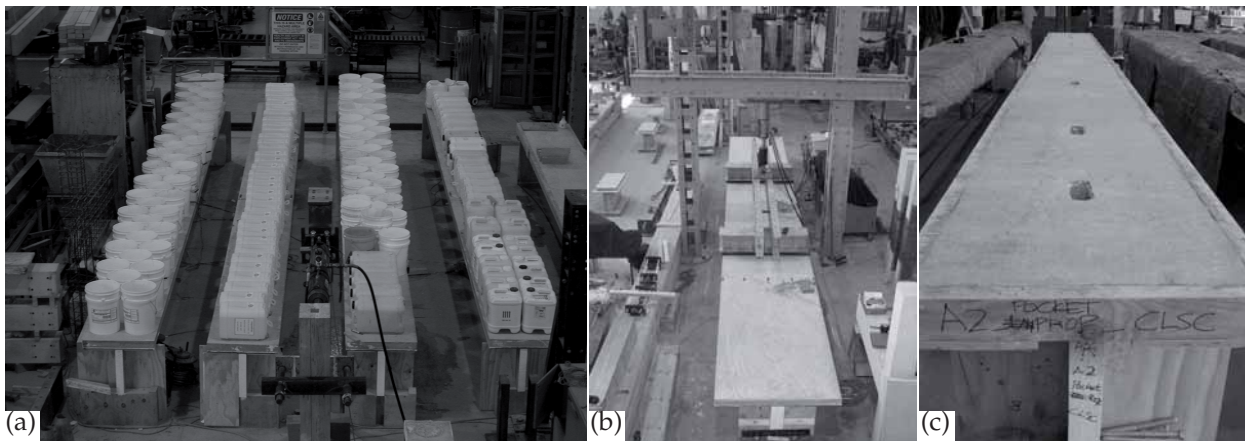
Full scale TCC T-beams at the UC – (a) arrows pointing to four beams under service loads using buckets of water, (b) an 8 m beam, 1200 mm width ready for collapse test at four point bending, and (c) arrows pointing to connection pockets in beam.
